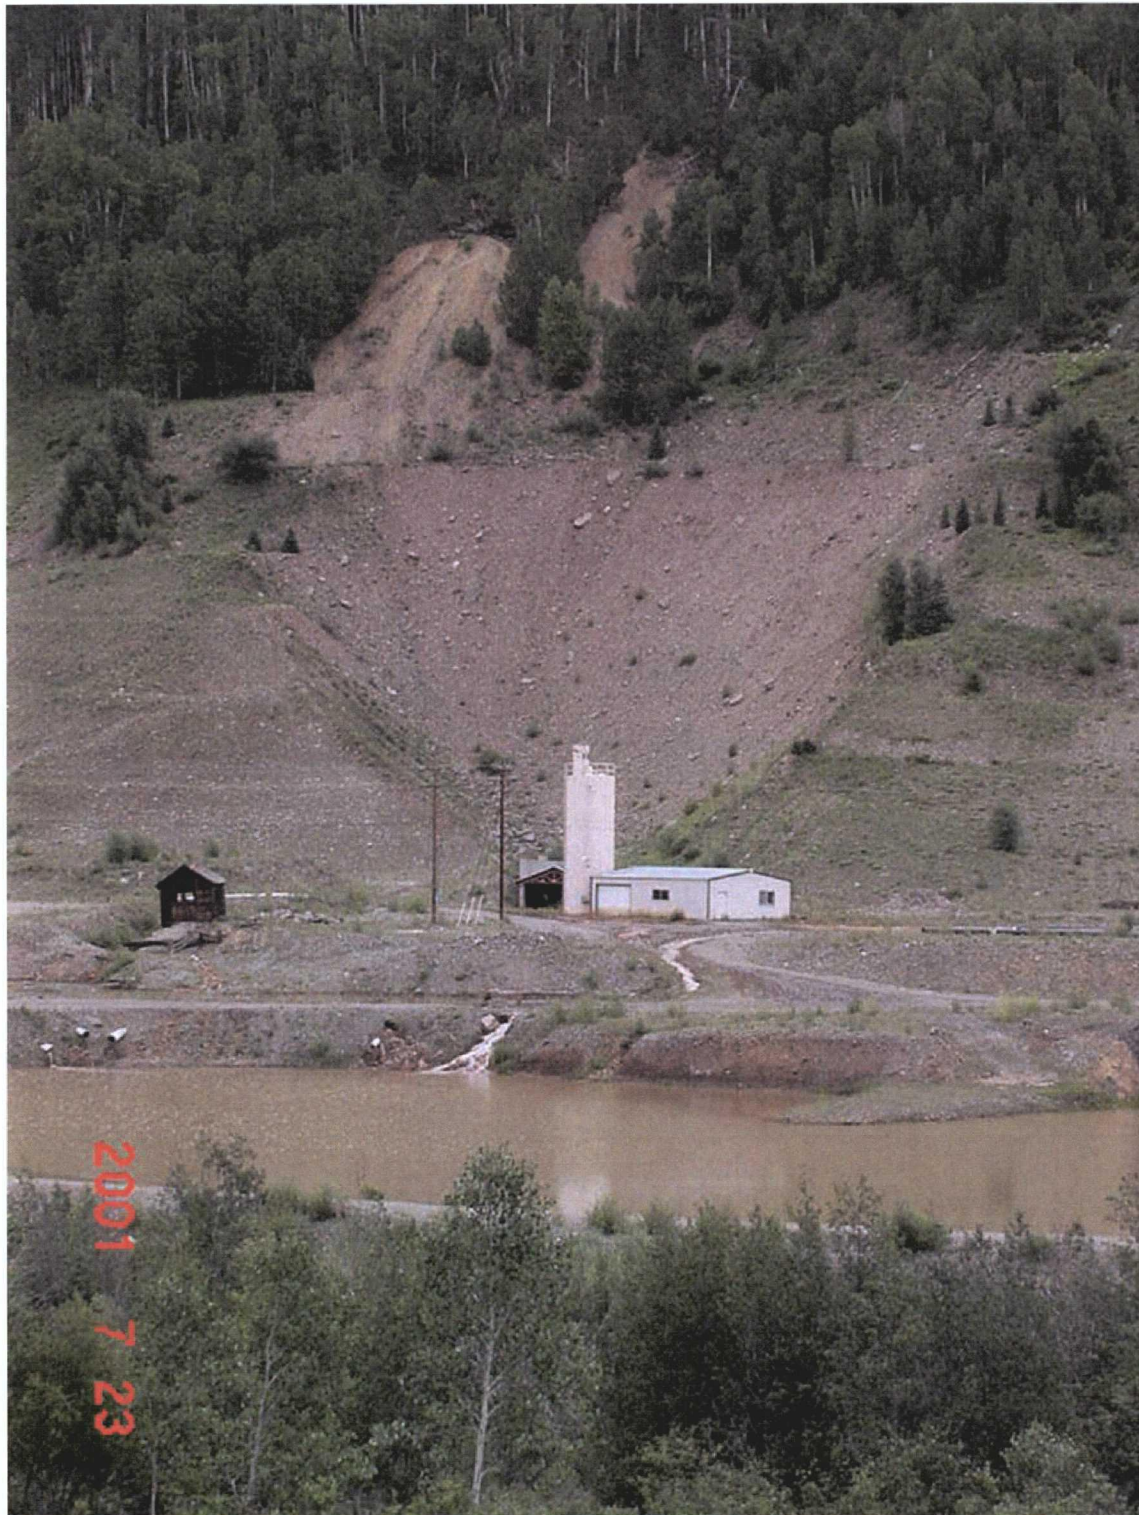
Excavation over St. Louis Tunnel as of 7-23-01
